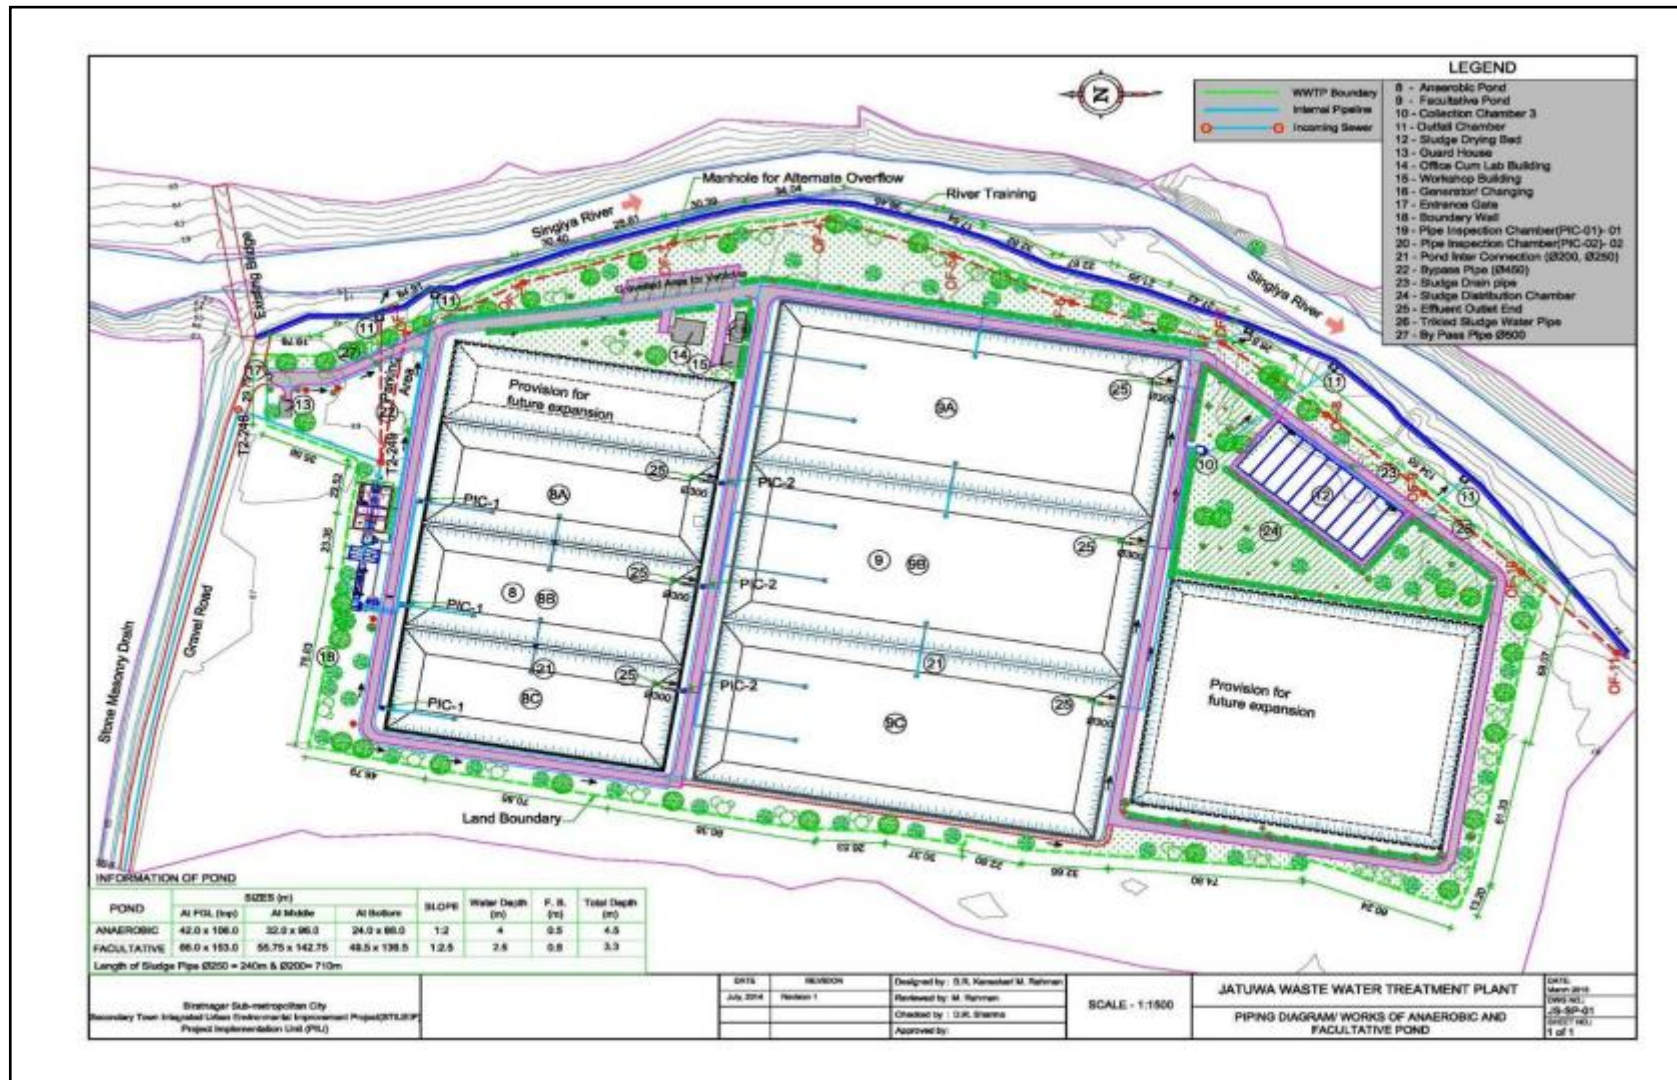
Proposed Waste Water Treatment Plant at Jatuwa in BSMC
